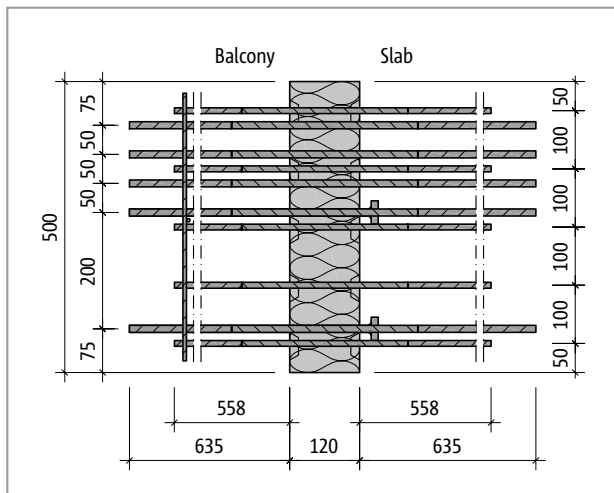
Schöck Isokorb® XT type C-L-M1-V1: Product plan view
